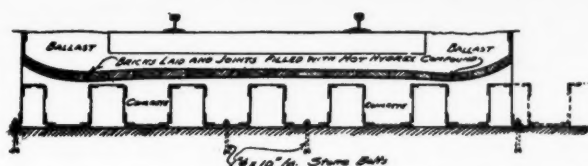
P. R. R. METHOD OF WATERPROOFING BRIDGE FLOORS.
